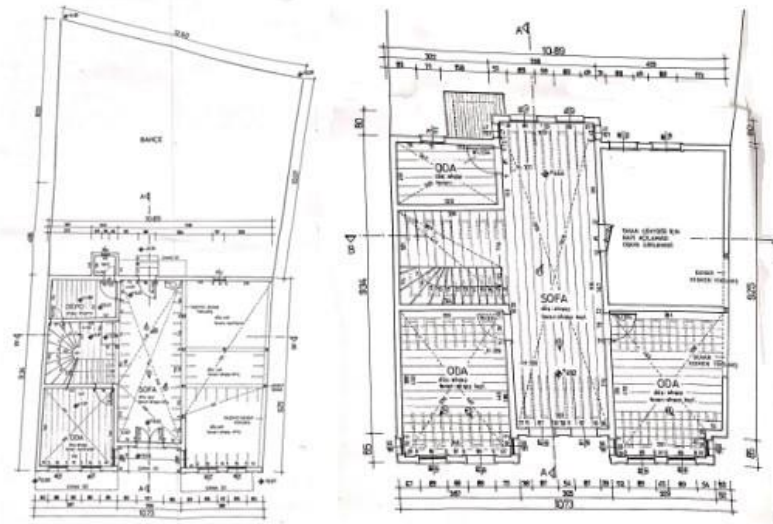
Basement and 1. floors plan of parcels number 10 (Scale.1/50)
